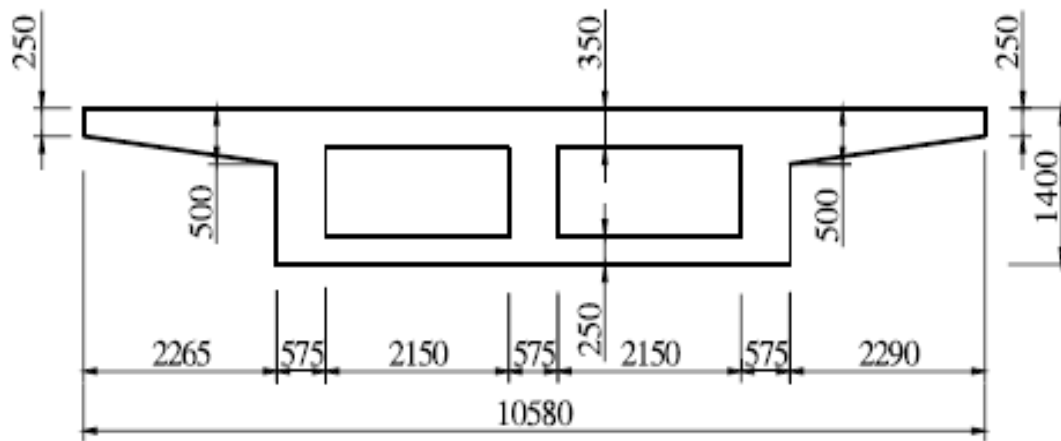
Cross section of the bridge superstructure (Law and Li, 2010).
